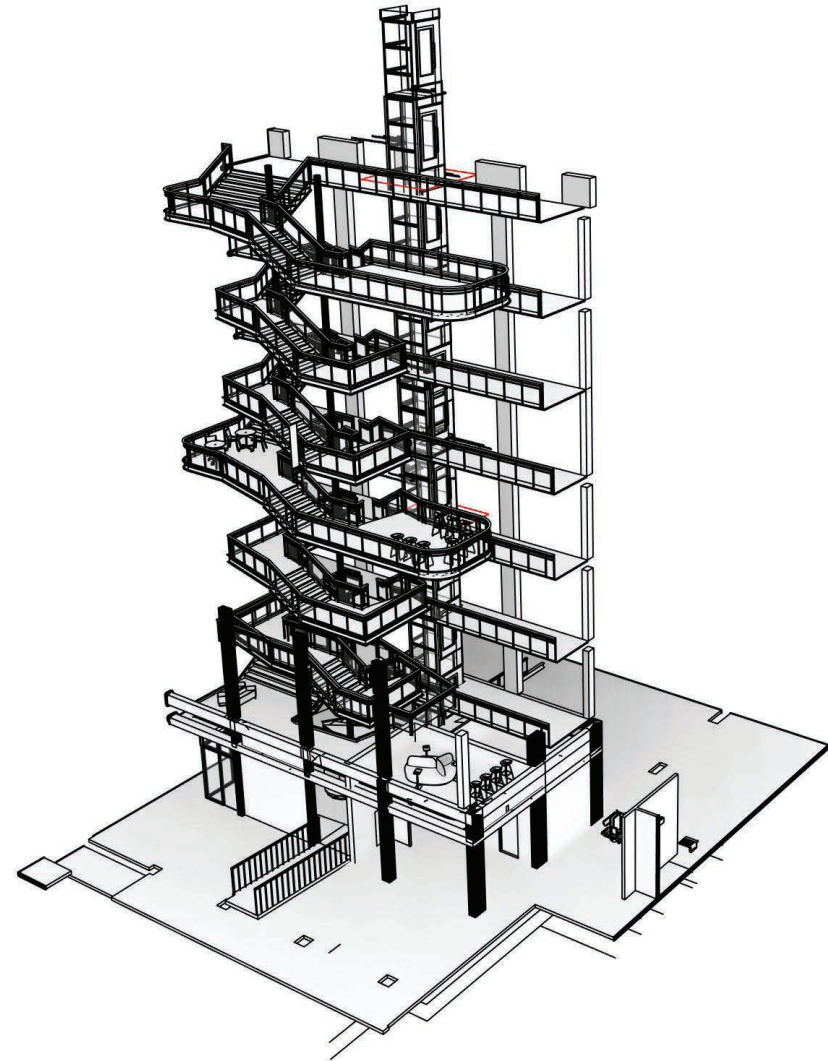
Axonometric and plan view of design draft 2 of the staircase design (September 2019)
